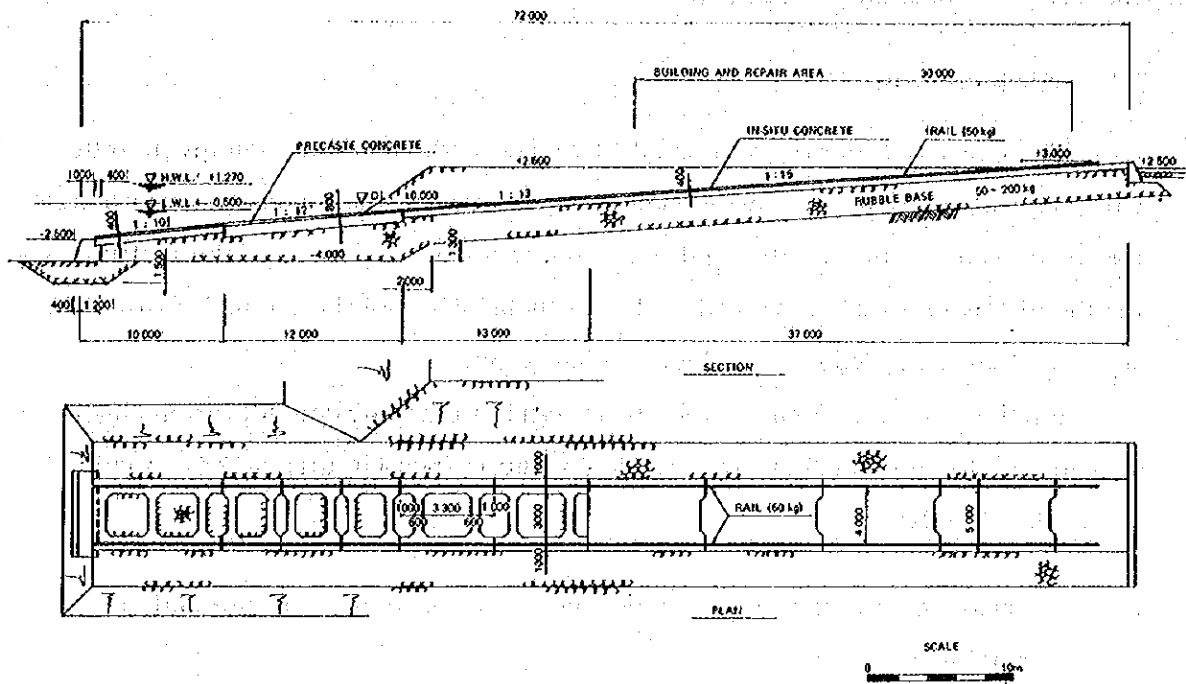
Cross Section of Dry Dock — Camaligan Port
